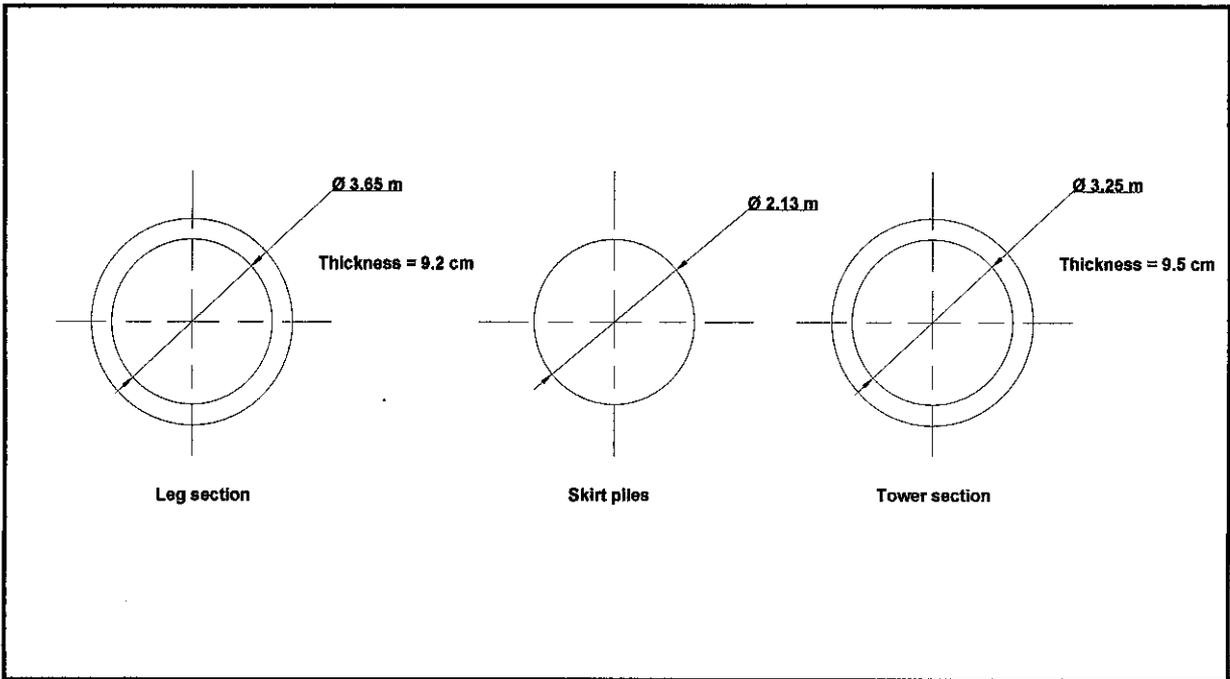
Cross-section of tubular members of Baldpate Tower
